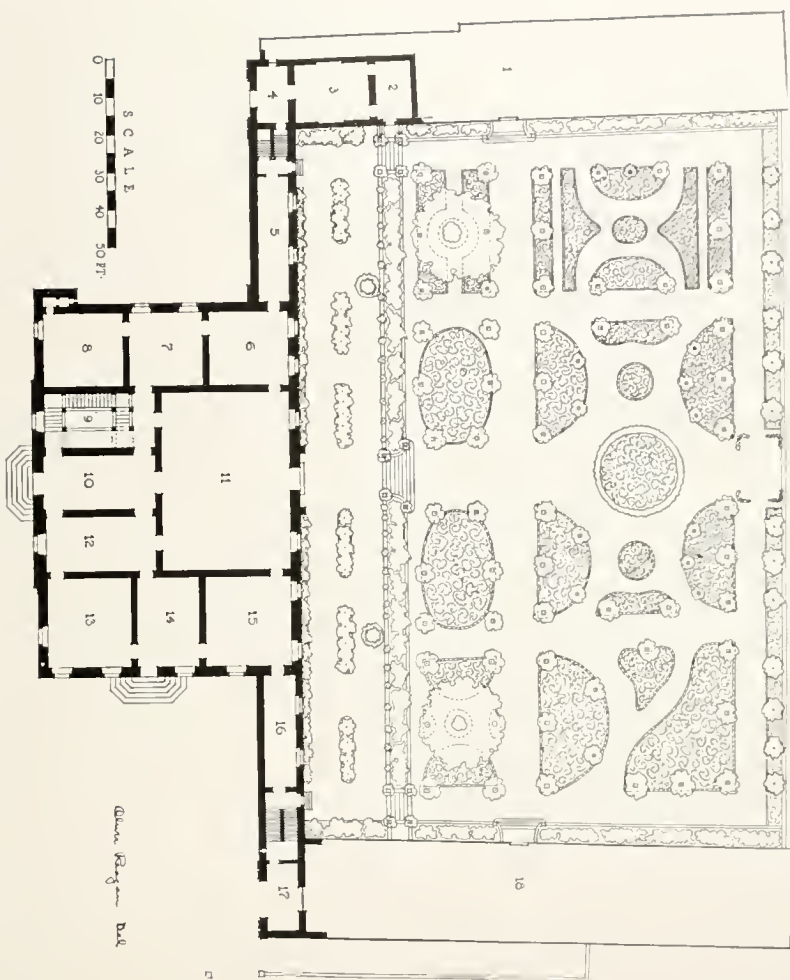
GROUND FLOOR AND GARDEN PLANS—POGGIO TORSSELLI, NEAR SAN CASCIANO, VAL DI PESA
